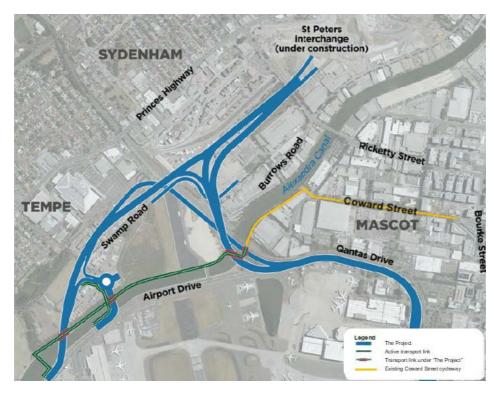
| Proposed active transport link and existing Coward Street cycleway (Source: Sydney Gateway Road Project EIS/pdMDP amended to highlight the existing Coward Street cycleway)
